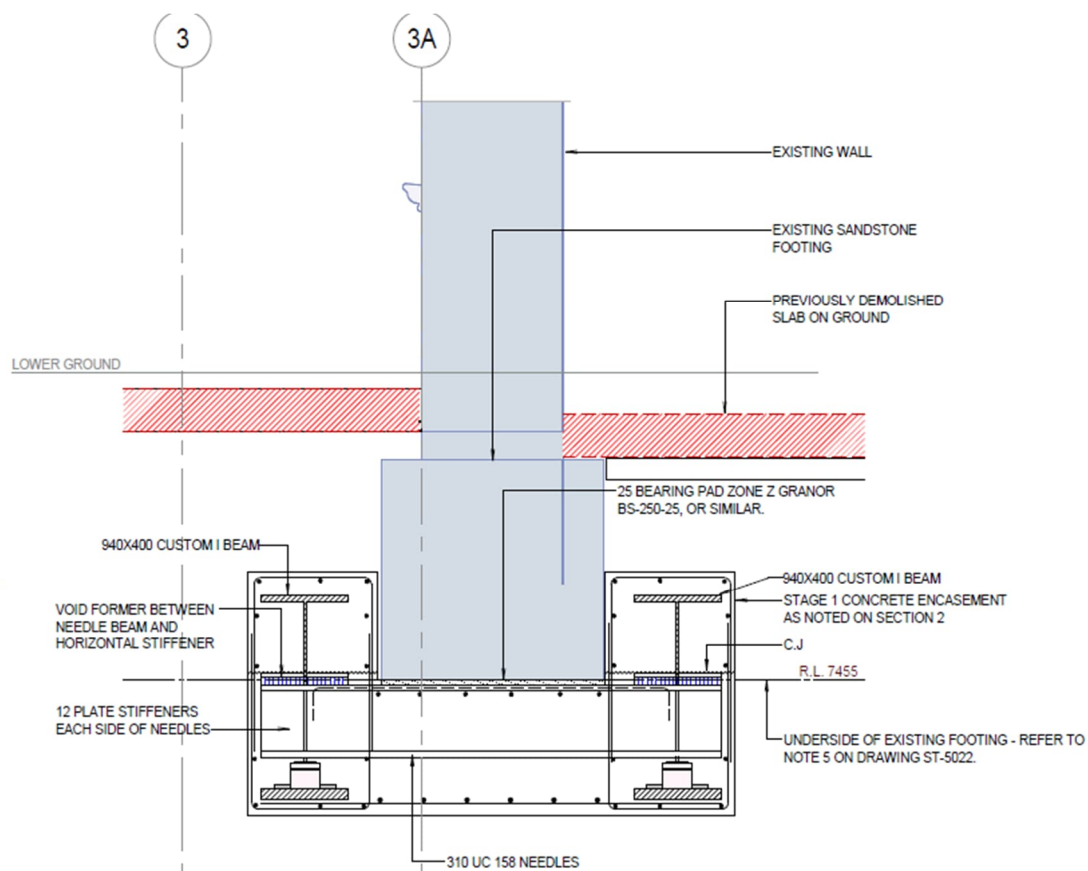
Typical cross section showing the connection between the mini niche beam and longitudinal steel members
